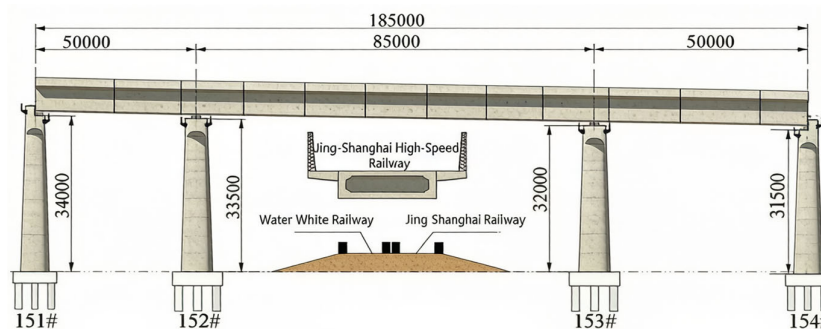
Schematic elevation of the new bridge (Zhengji High-Speed Railway) (Unit: mm).
